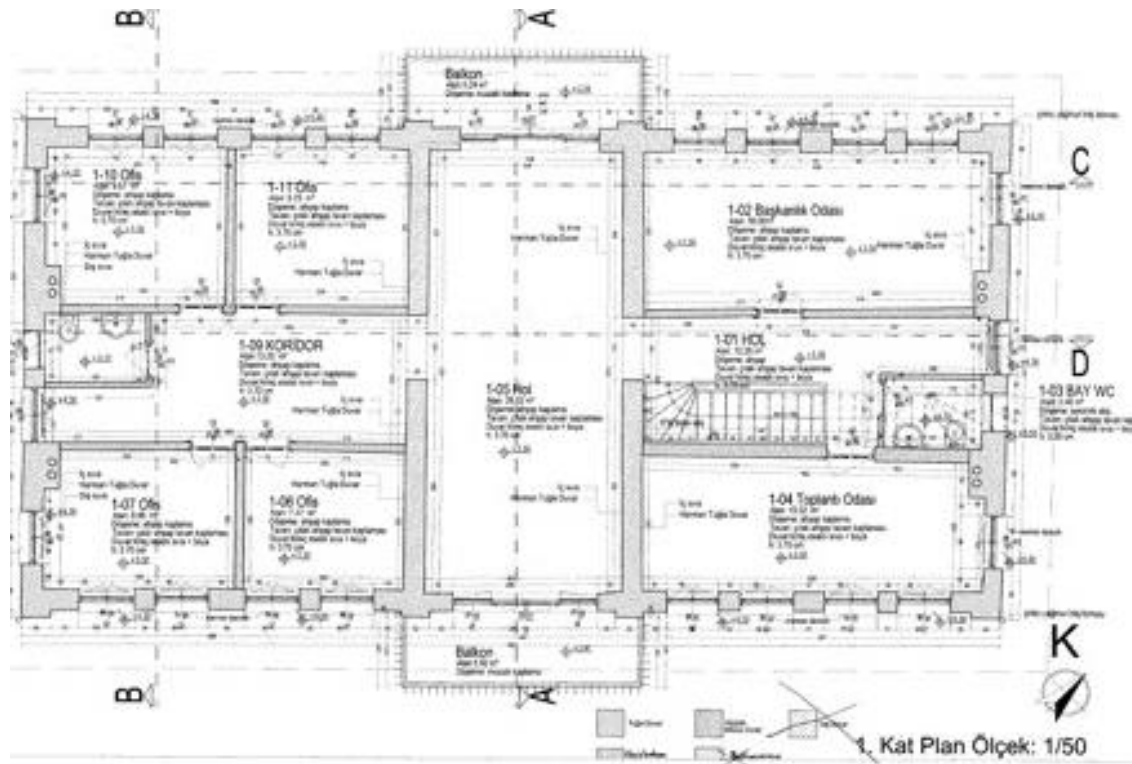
First-Floor Plan, [Bozdağ Architecture Company] [25]
